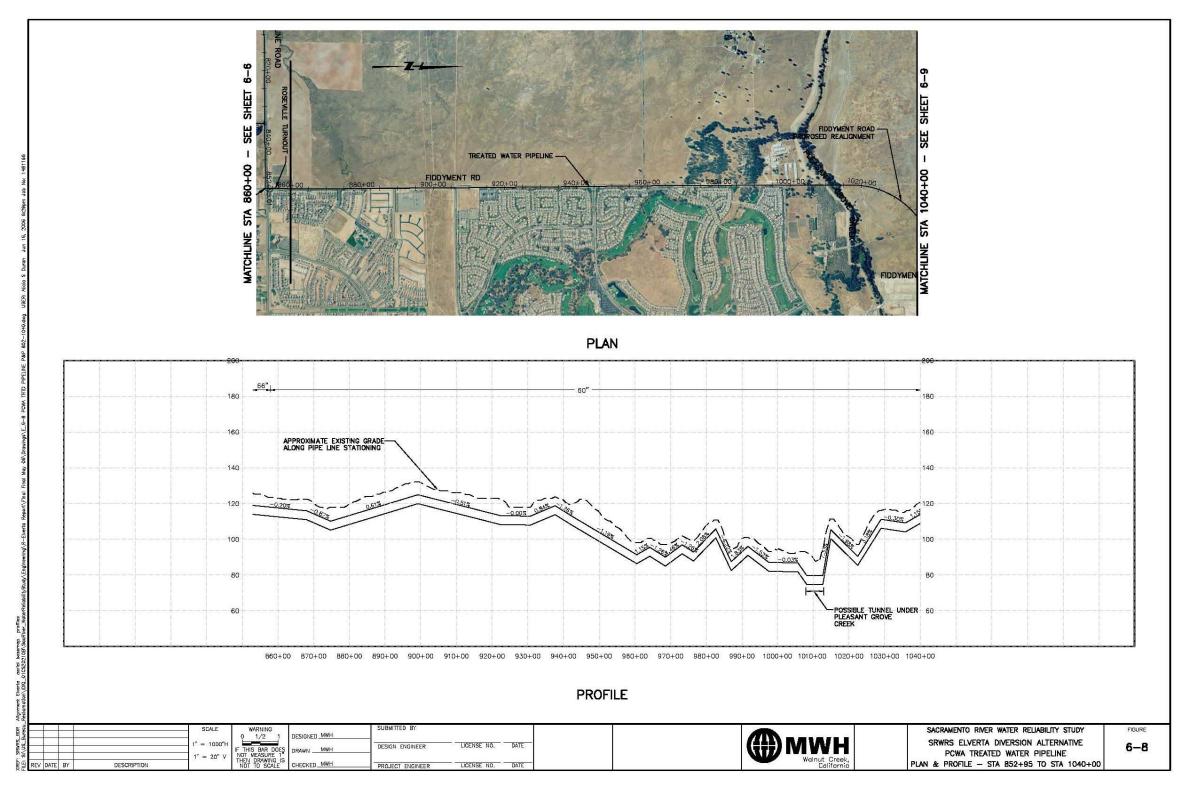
SRWRS Elverta Diversion Alternative PCWA Treated Water Pipeline Plan and Profile – STA 852+95 to STA 1040+00
